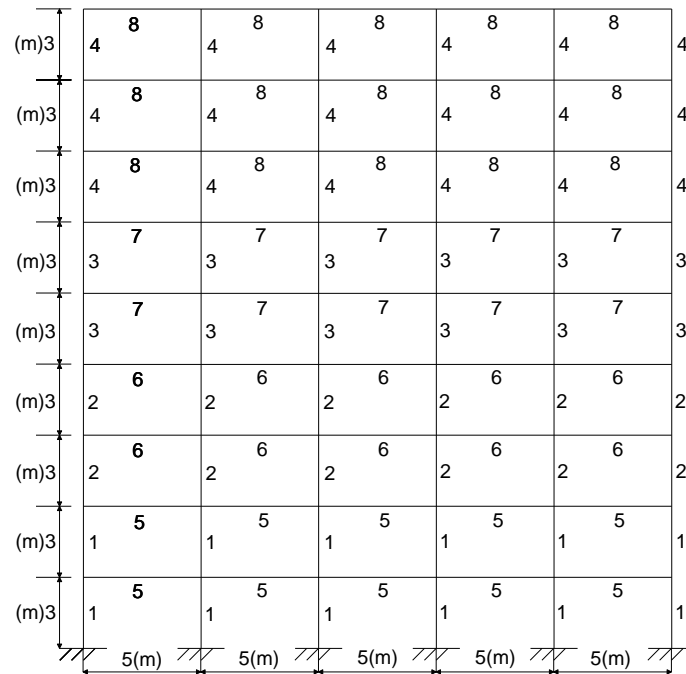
Geometry and member grouping of the 5-bay, 9-story steel frame
